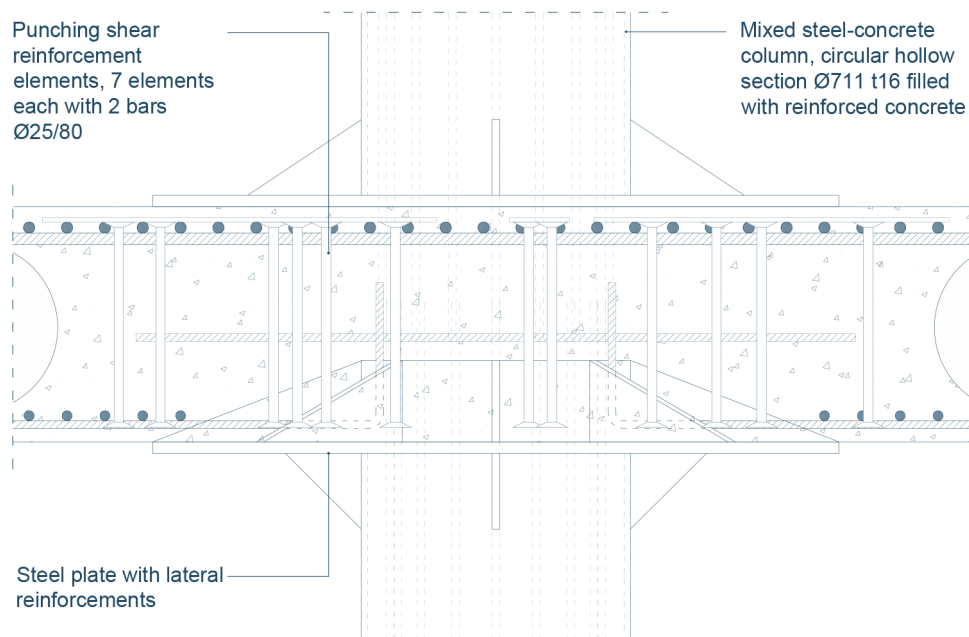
Intermediate connection between column and plate highlighting the the punching shear reinforcement
